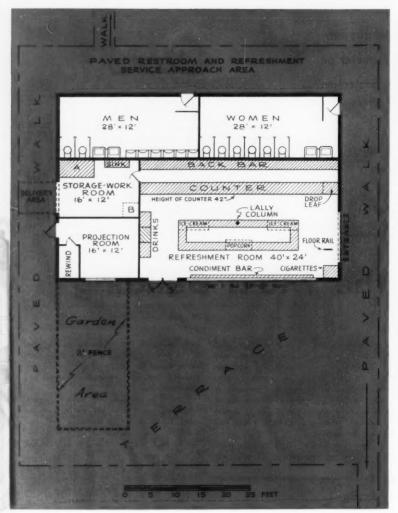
Illustrating space requirements of a main building housing refreshment facilities, restrooms, and projection room in common location on ground floor. This layout provides accommodations usually ample for a medium-sized drive-in. For details of plumbing see Figure 4. In off-seasons storage-work room could house a jeep. Otherwise space B could be used for preparing a food specialty.
